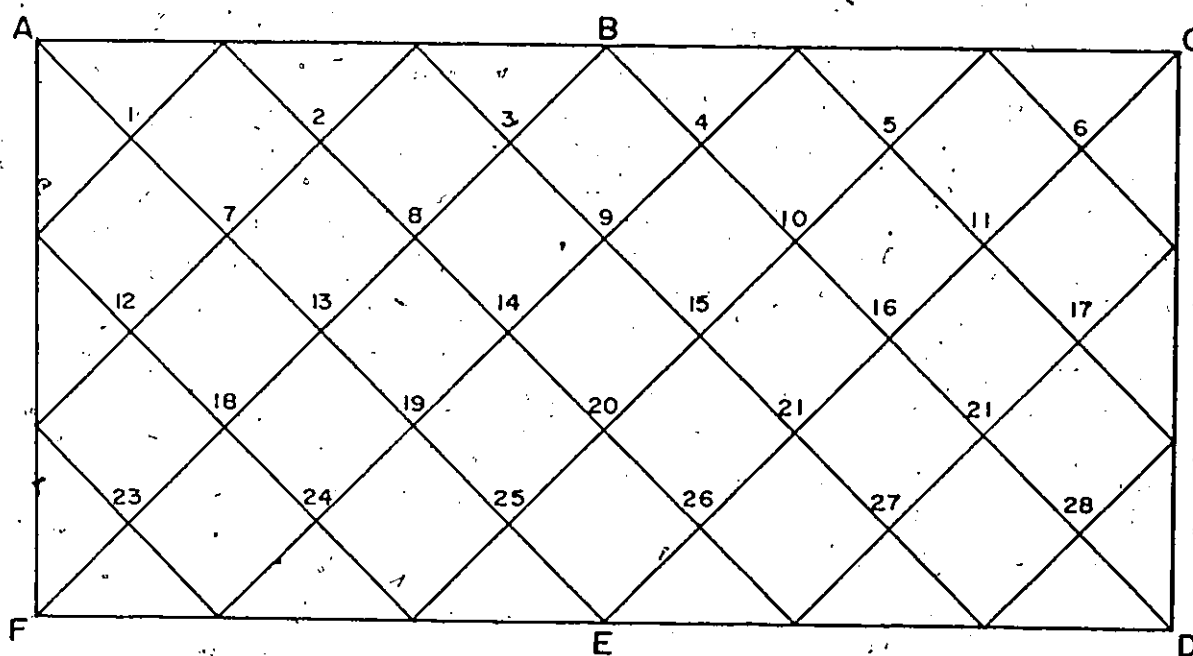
PLAN OF ORTHOGONAL DOUBLE ROOF
